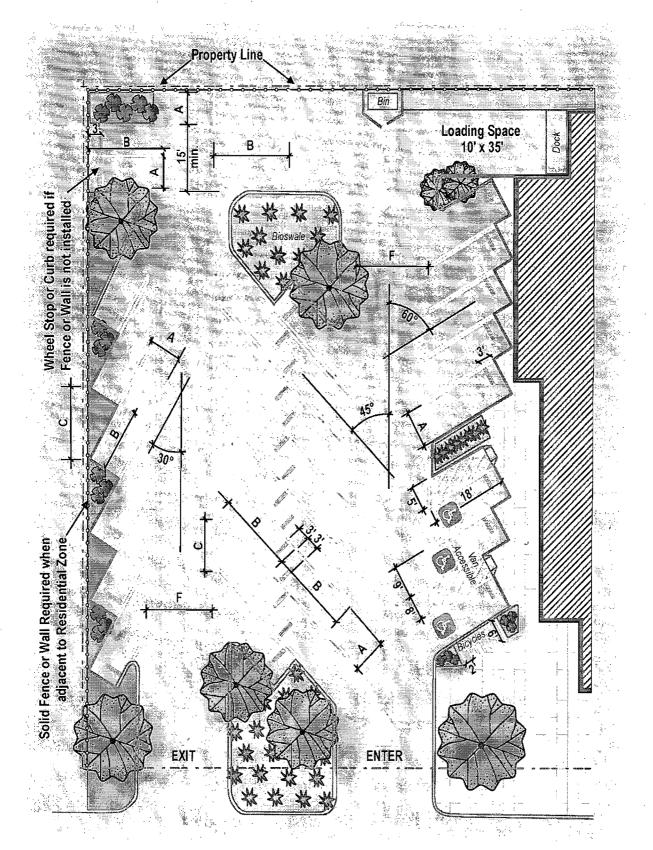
Minimum Dimensions for Common Parking Lot Layouts
